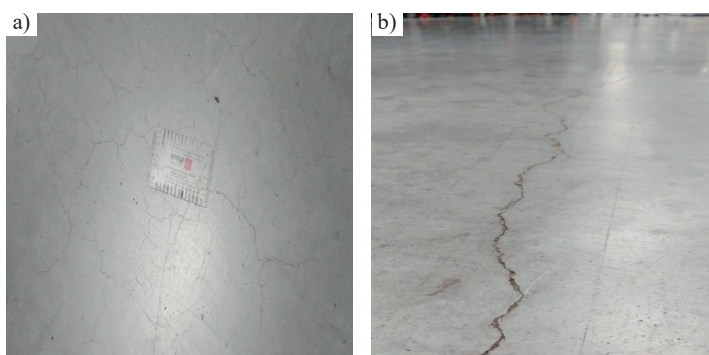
Examples of surface cracks known as crazing (a) and structural cracks with visible edge spalling (b)
